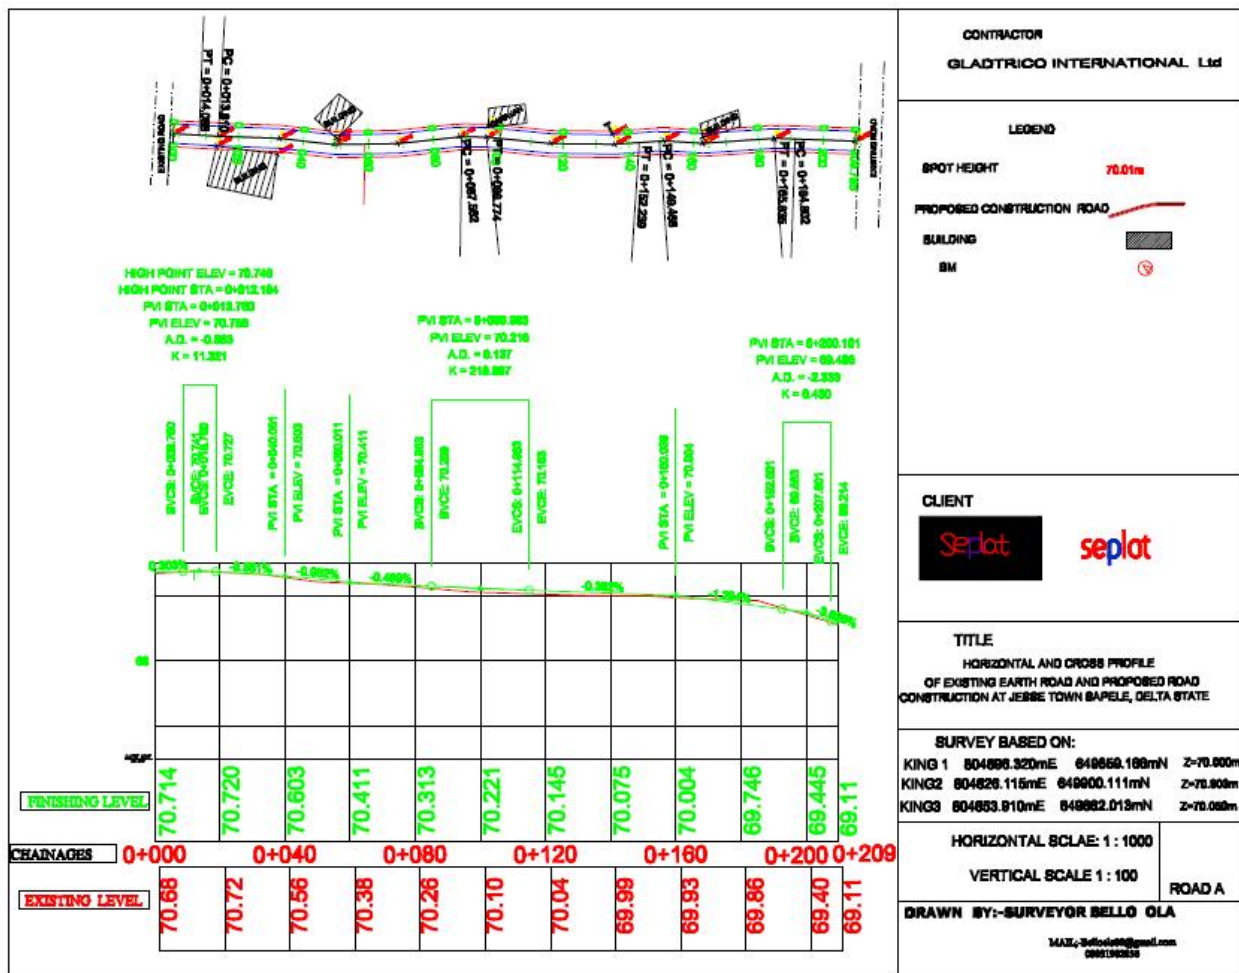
Horizontal and cross profile design of existing and proposed road at Jesse, Sapele, Delta State (road A).
